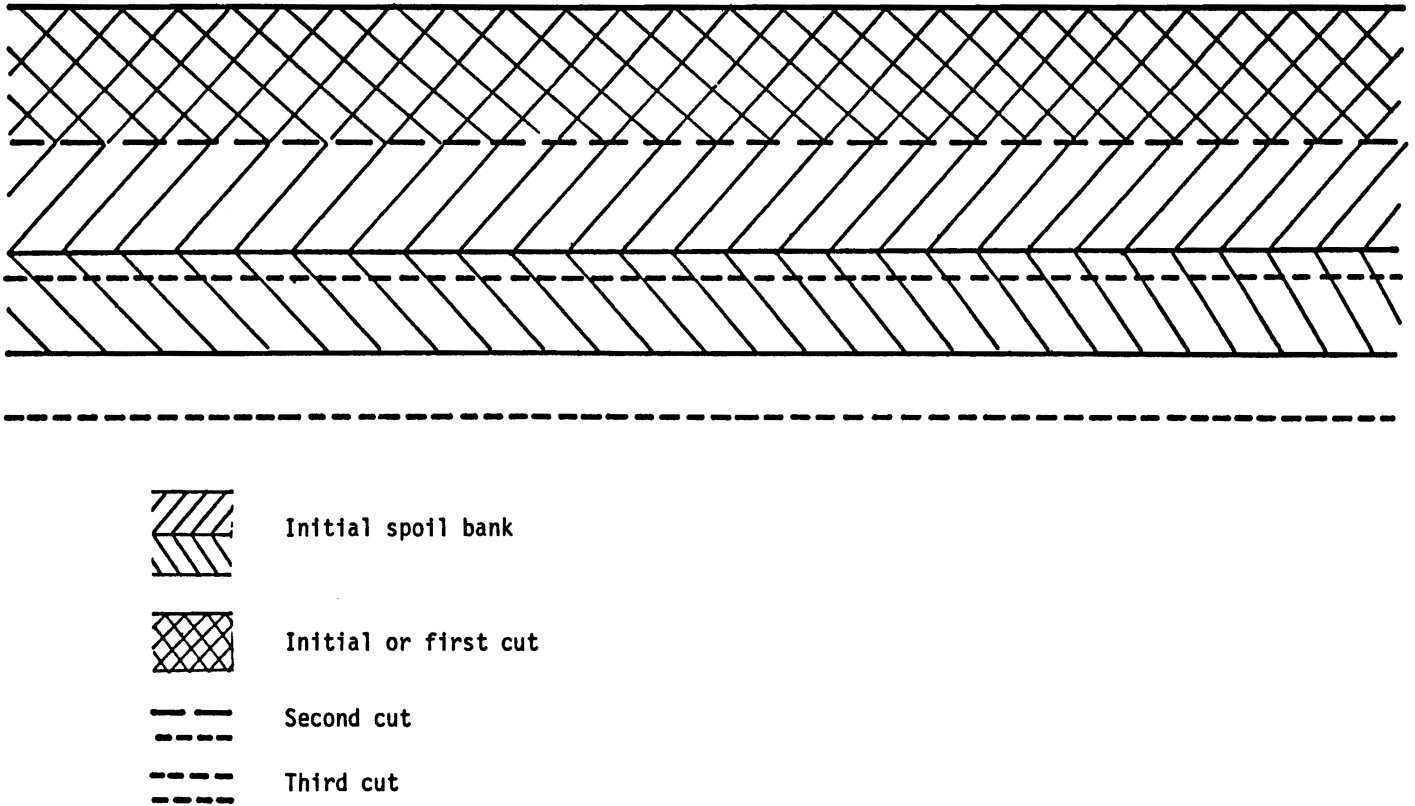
Depositing spoils on the side of the initial cut to be mined.
